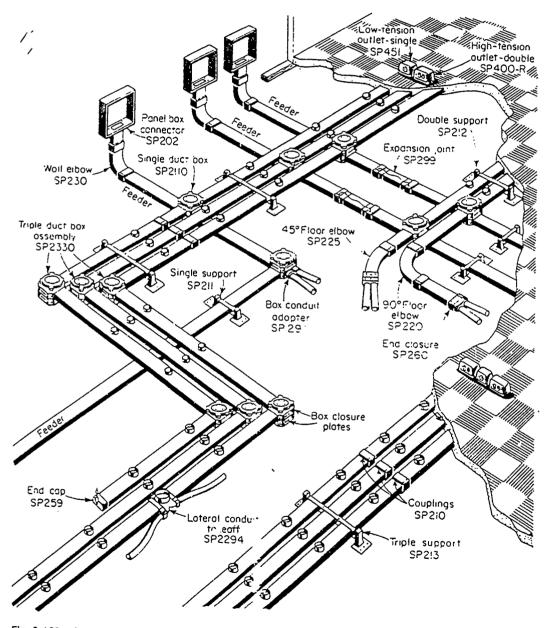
Component parts and method of instillation for two-level steel underfloor niceways. [Ceneral Electric Co.]
